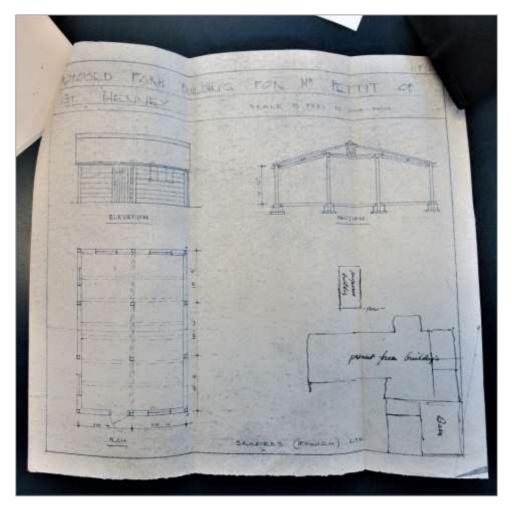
Plans for prefabricated farm building, 1947 (ERO D/RH/ Pb1/1181)
